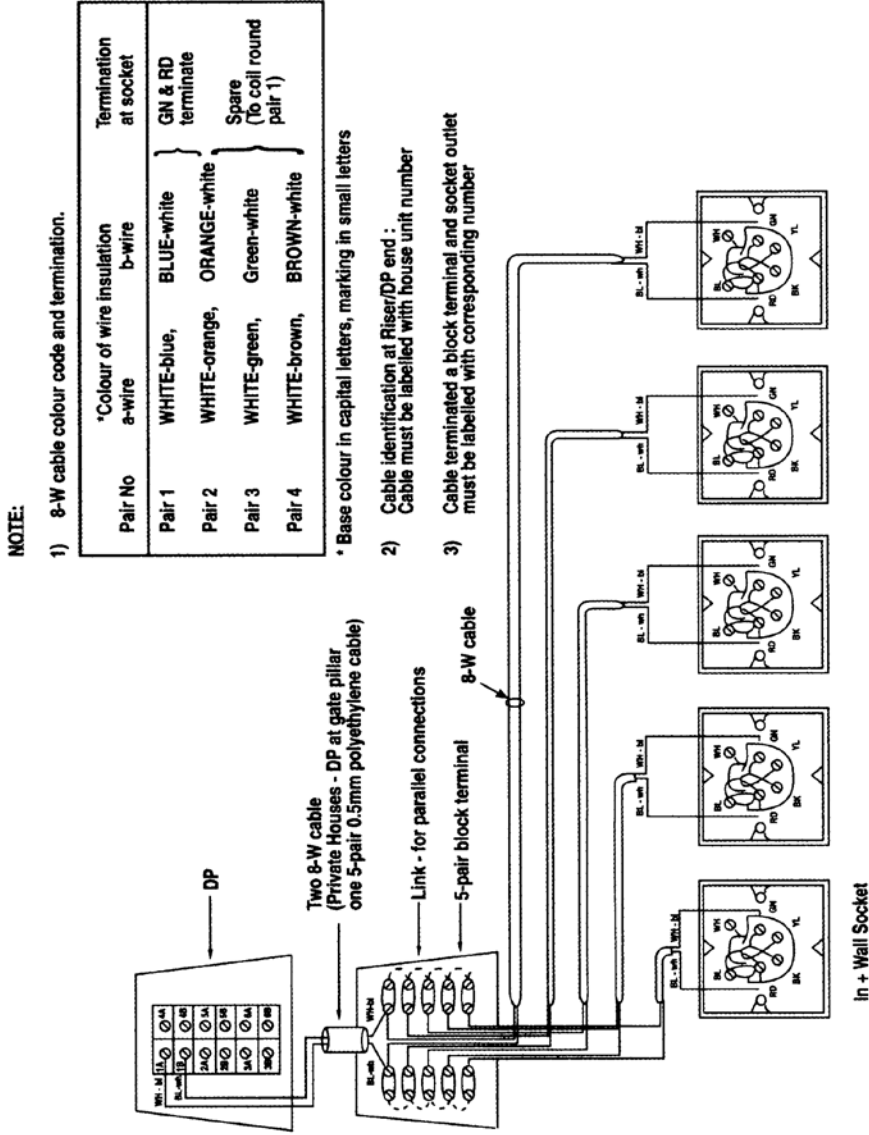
Telephone wiring configurations for residential building – Detailed connections
